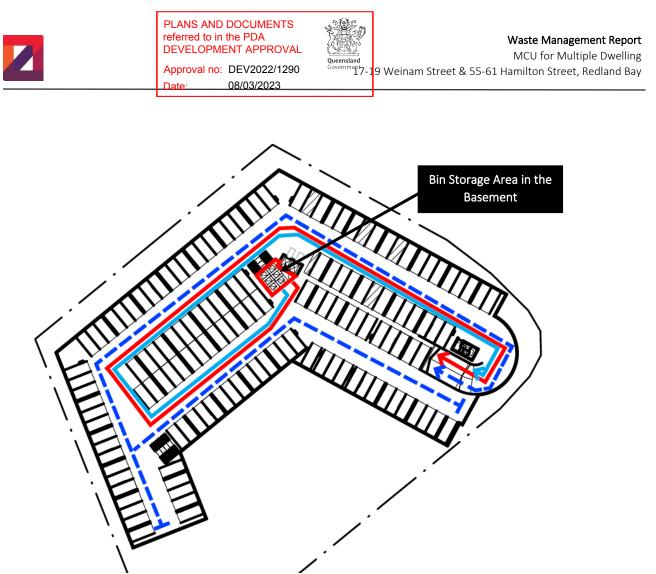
Basement Level Plan indicating the Waste Storage Area (Source: Archidiom)
